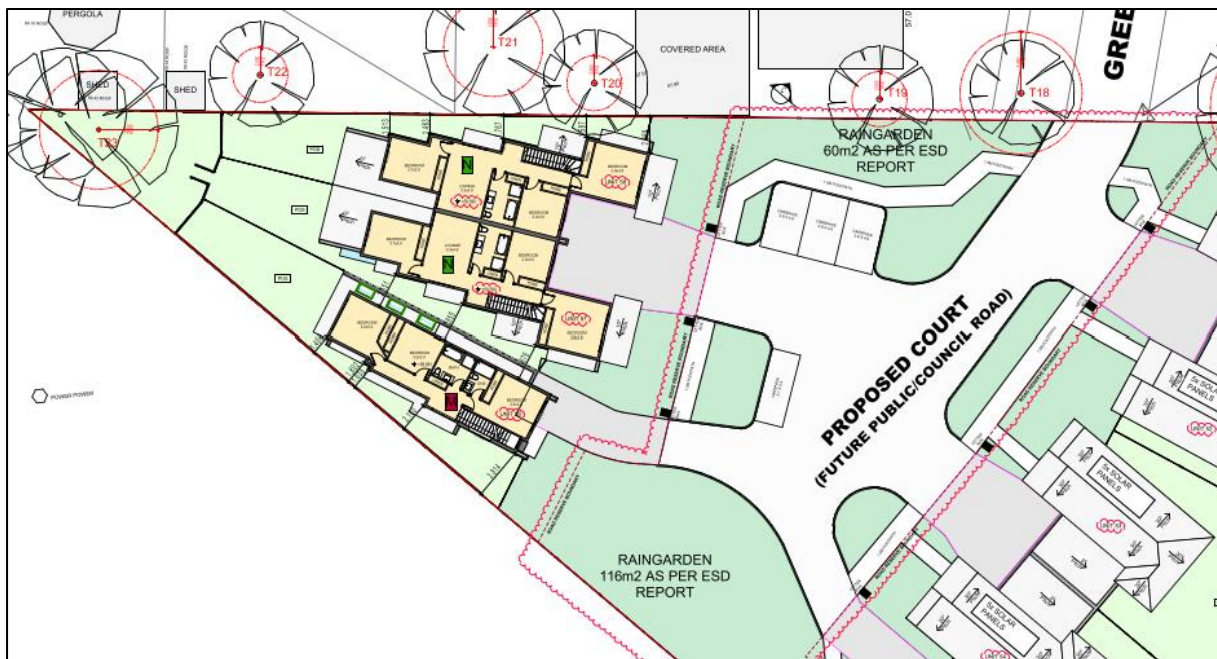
(above): Part site and upper floor plan of dwellings 56-58. Source: Application documents.
